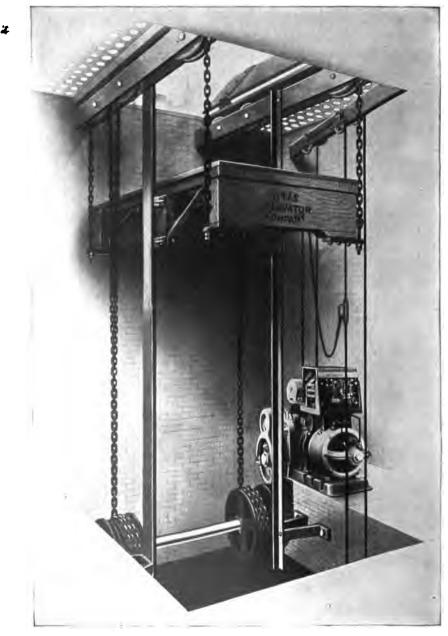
Otis Elevator Sidewalk Lift Courtesy of Otis Elevator Company
